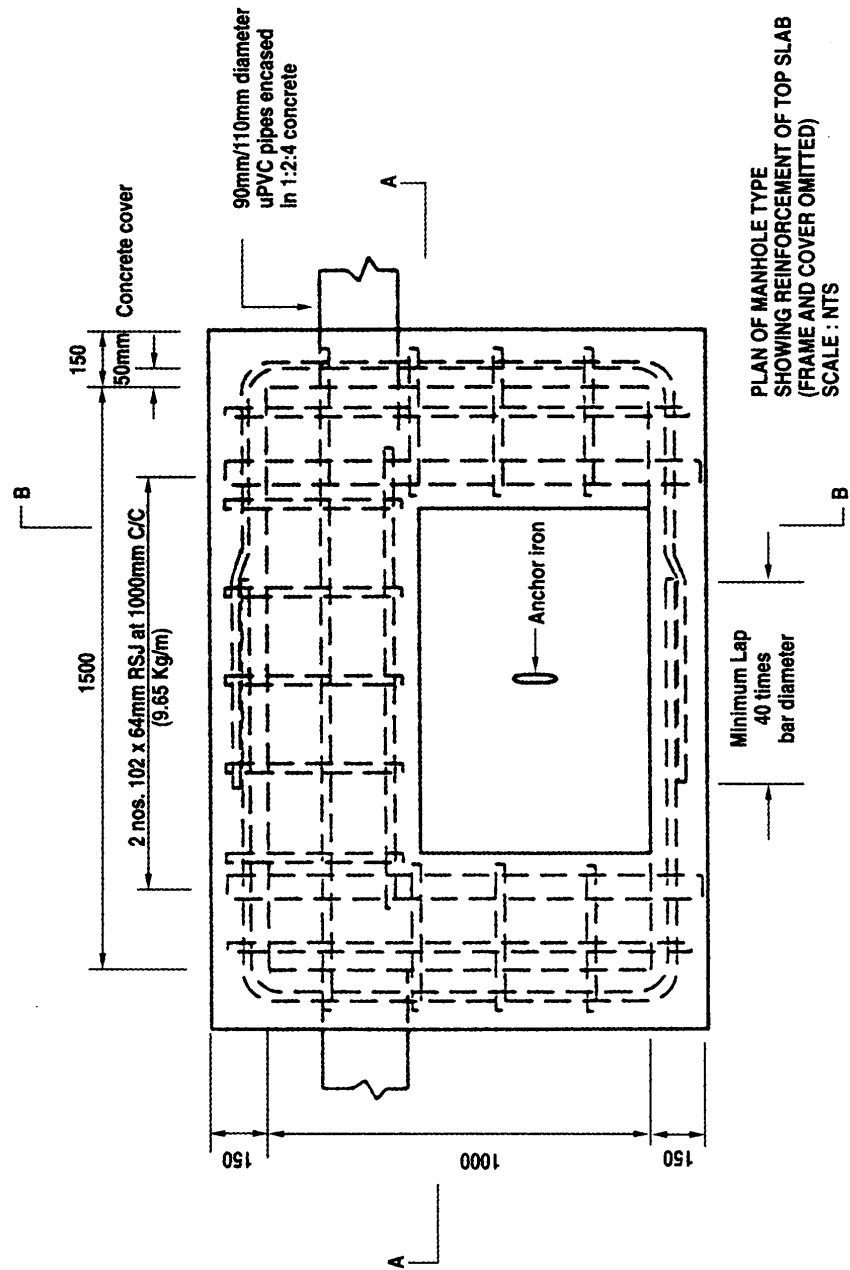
MANHOLE DRAWINGS - TYPE MX1
